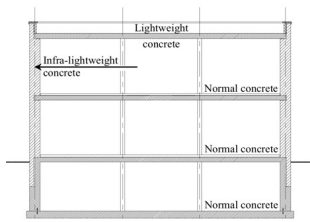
Layout of fair-faced concrete building with walls of insulating concrete and roof of lightweight concrete.
